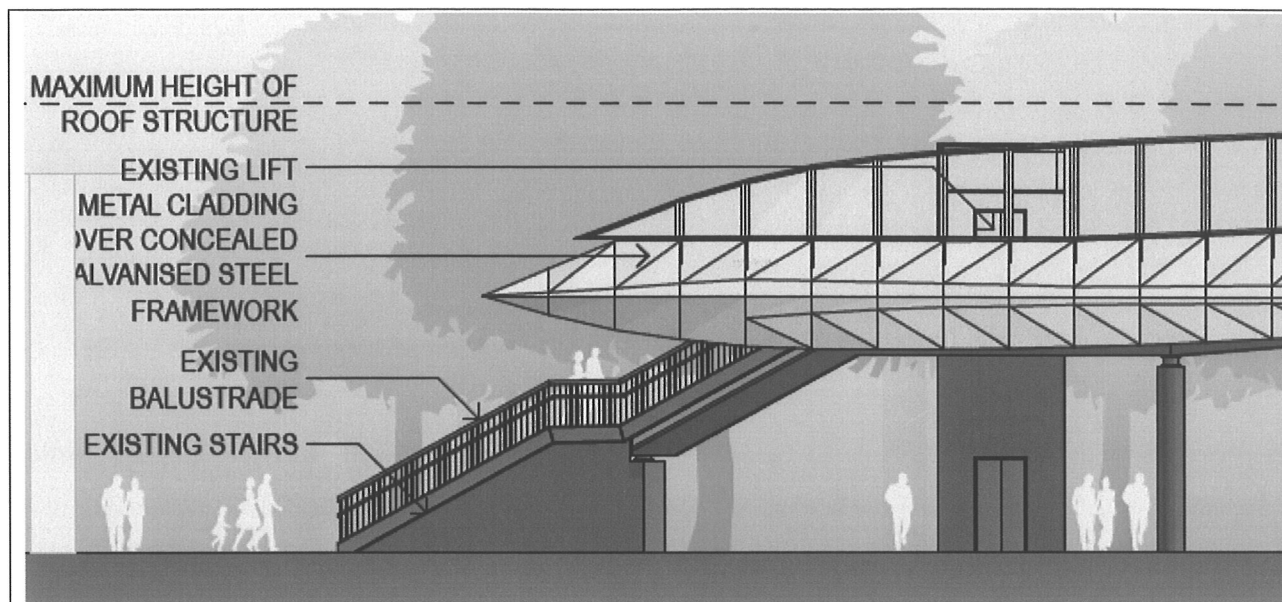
Proposed footbridge canopy design, (eastern end of footbridge)
